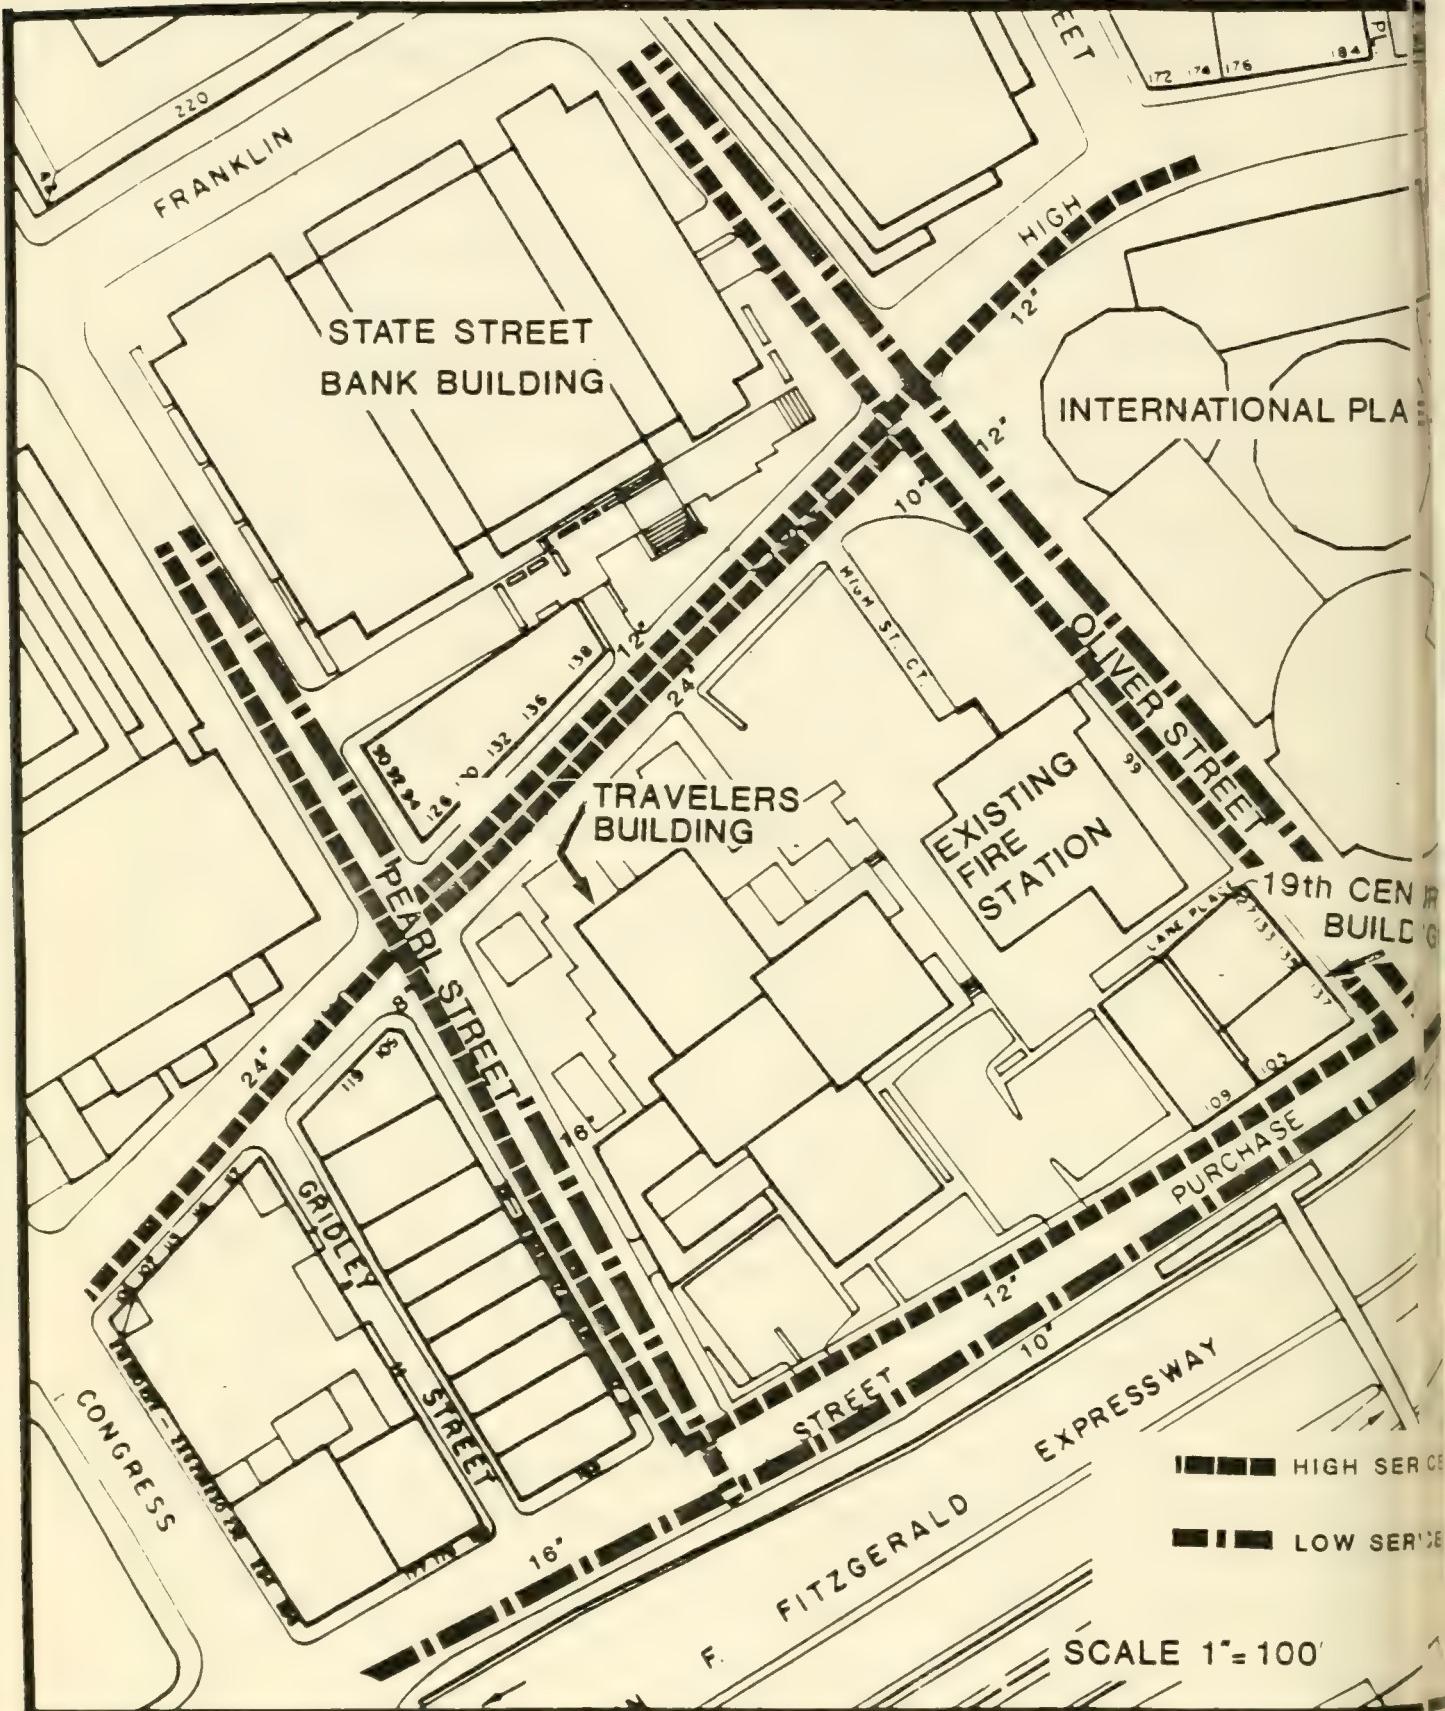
SITE AREA - EXISTING WATER SYSTEM
